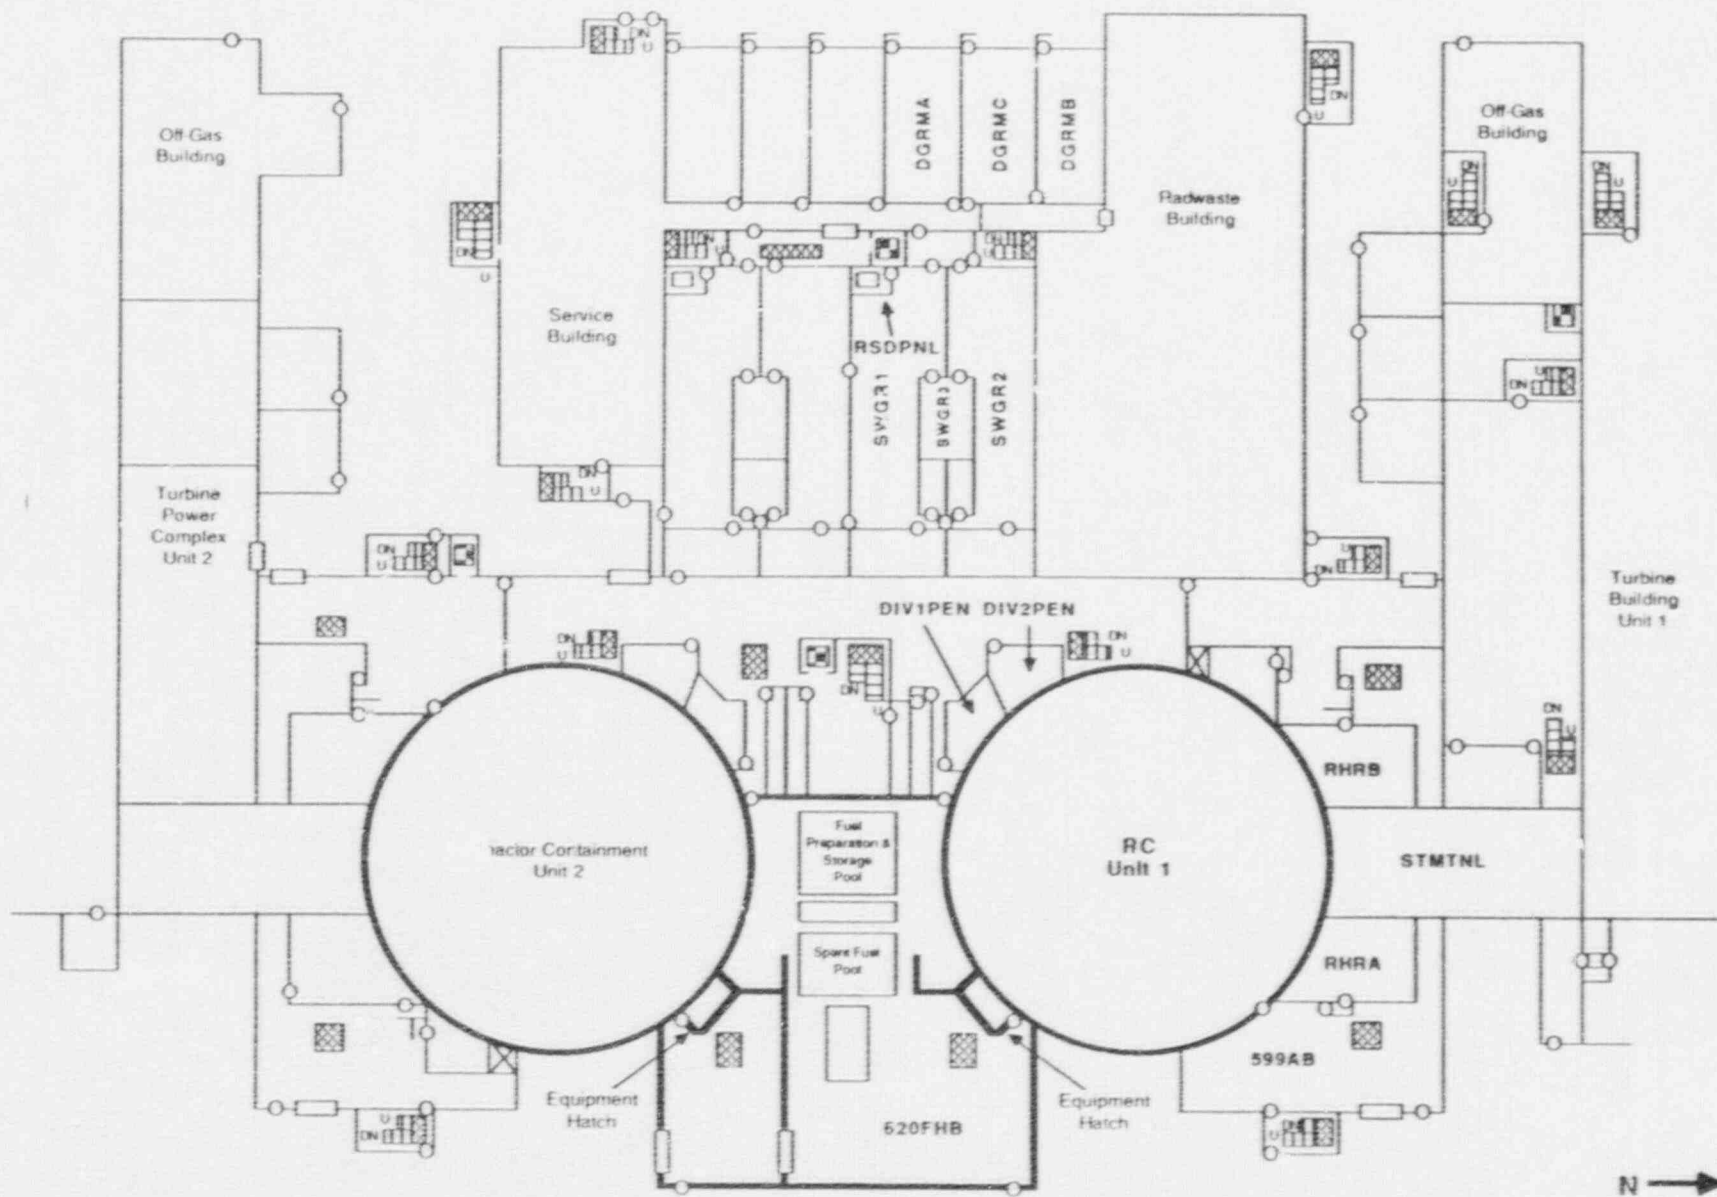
Perry 1 and 2 Reactor Building, Auxiliary Buildings, Intermediate Building, Control Complex, Diesel Generator Building, and Turbine Power Complex, Elevation 620'6"
